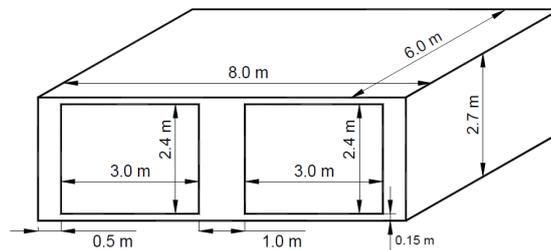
Base Building Case 600 - Isometric View of Southeast Corner with Windows on South Wall
